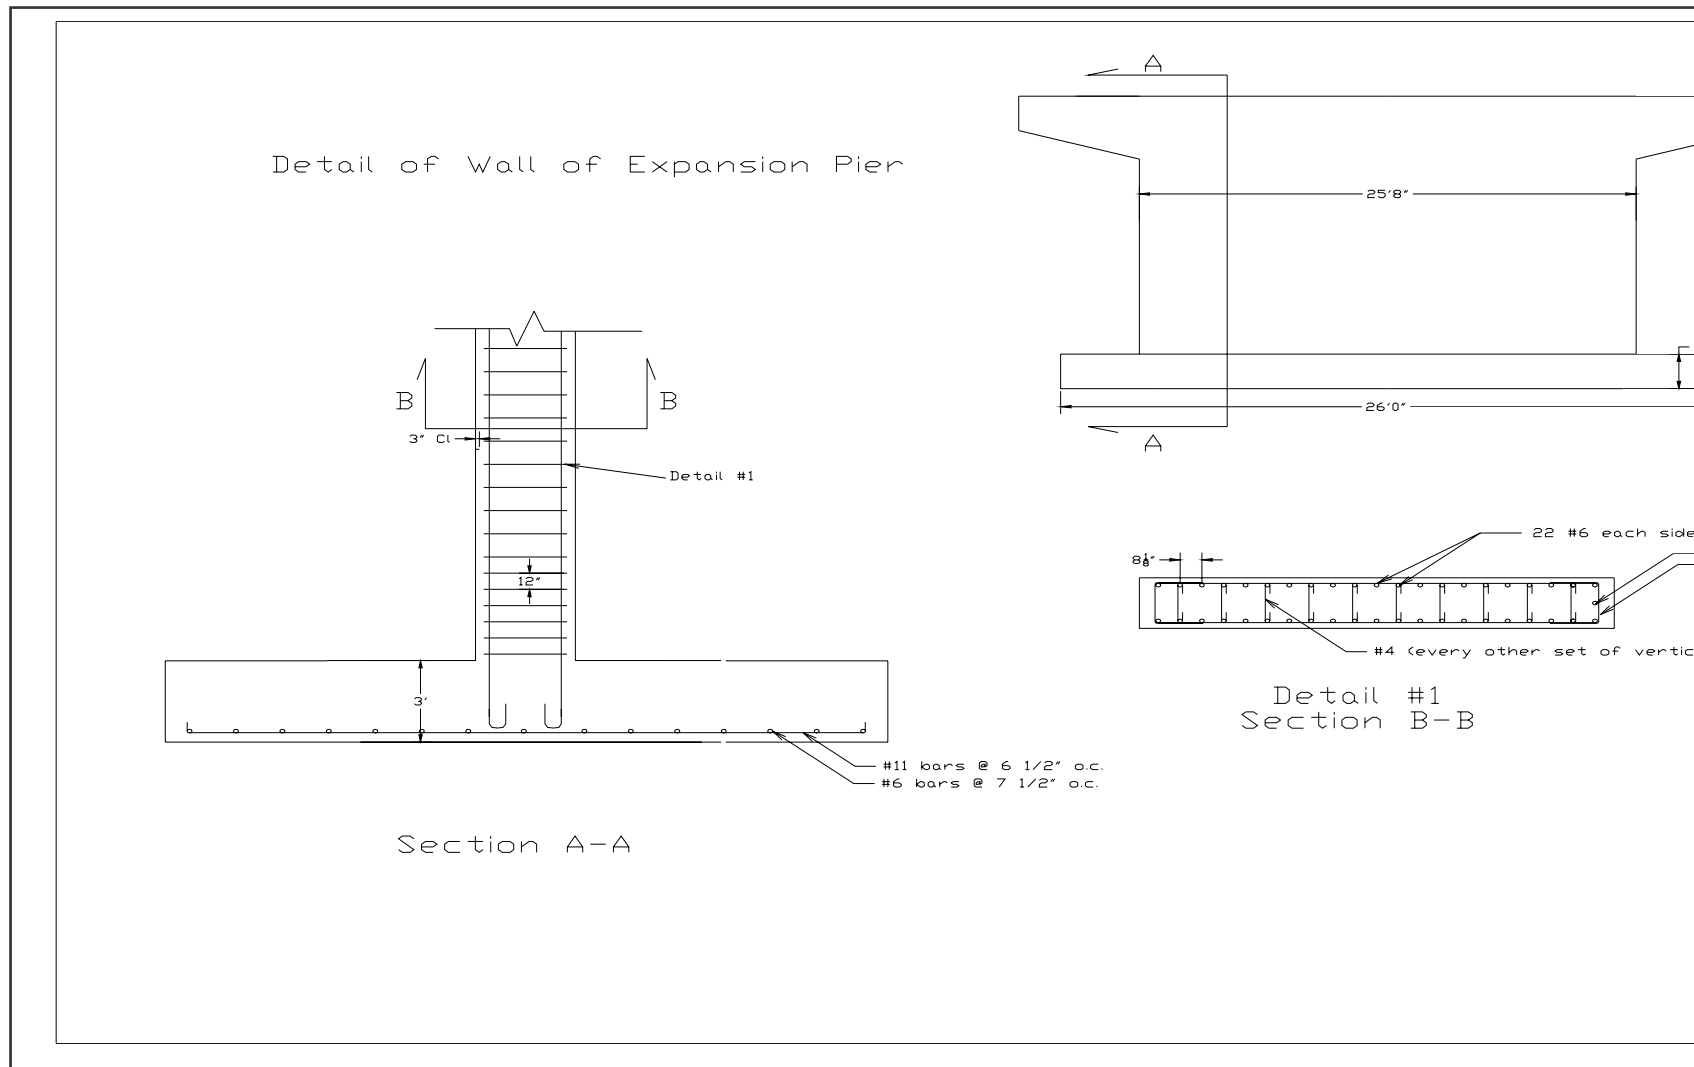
AASHTO Wall Design Details for Expansion Bent
